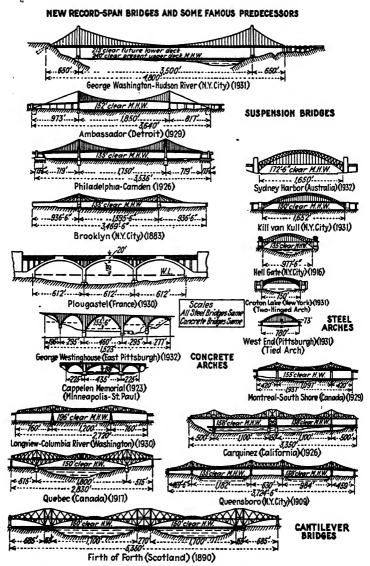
Achievements in long-span bridges. Sketches of various types of both steel and concrete structures showing span and general appearance. Golden Gate bridge span will be 4,500 ft.
